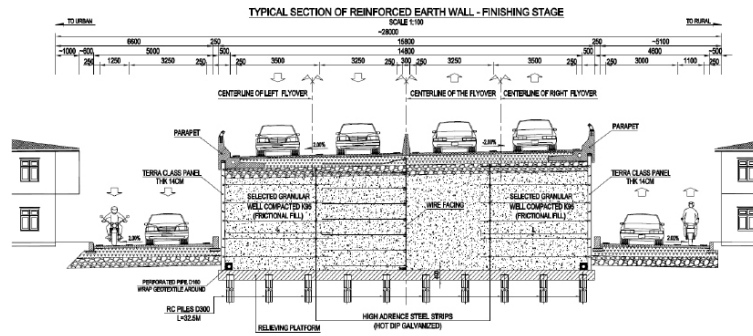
Section of stage 2 of a two-stage construction of Reinforced Earth
